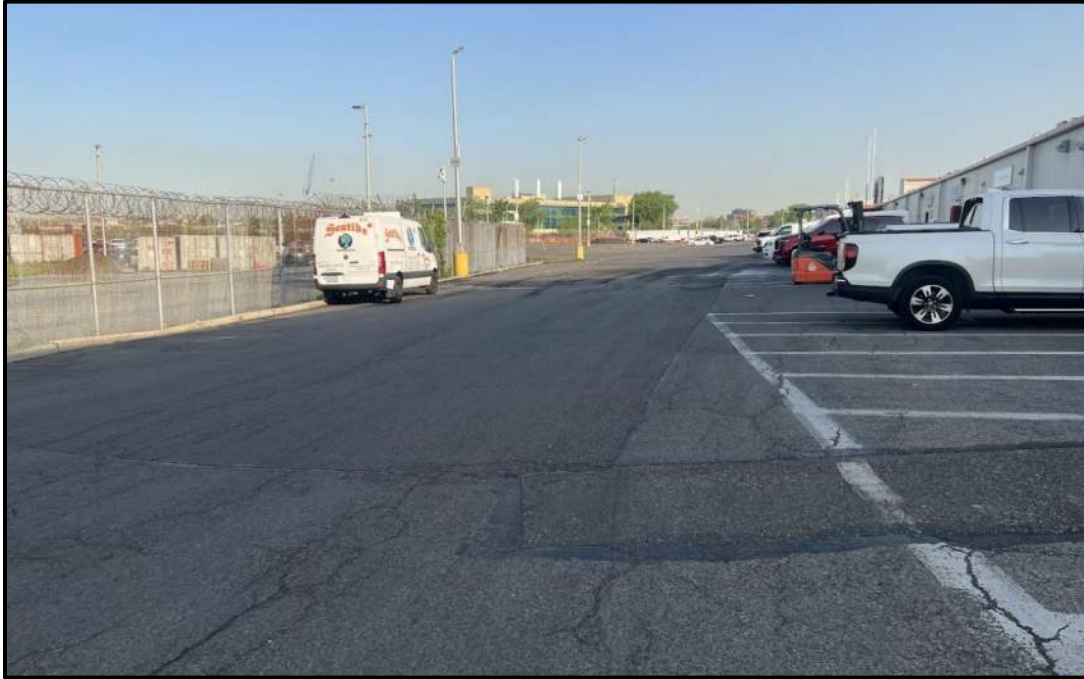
Facing northeast in the southwestern portion of Site; areas of re-paving performed in August 2022.
